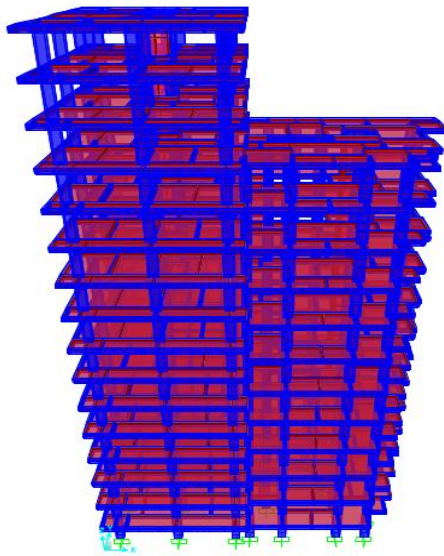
3D View of G+15 building with 3.2m floor to floor height & G+11 buildings with 3.5m floor to floor height without FVD
